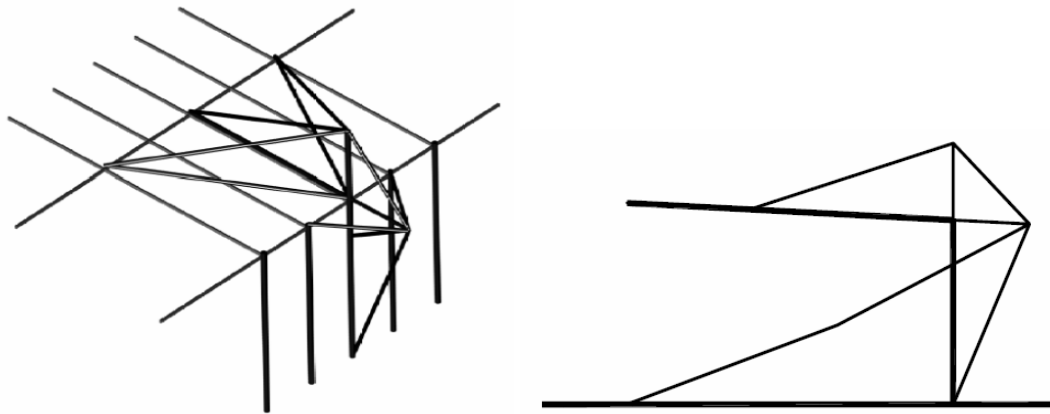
left: Spatial cantilever element of roof structure; right: cross section of structure
